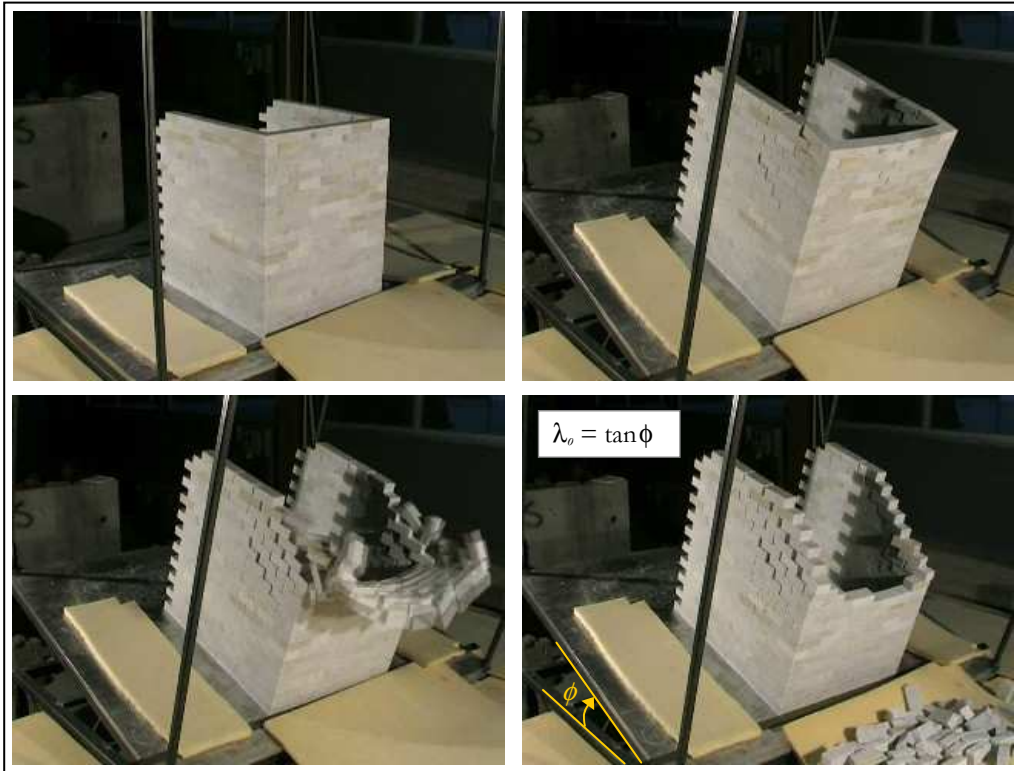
Tilting table tests on dry-stack masonry walls by *Restrepo Vélez and Magenes [2009]*. The shown test corresponds to wall r9. (Graphics used with permission from IUSS Press.)
